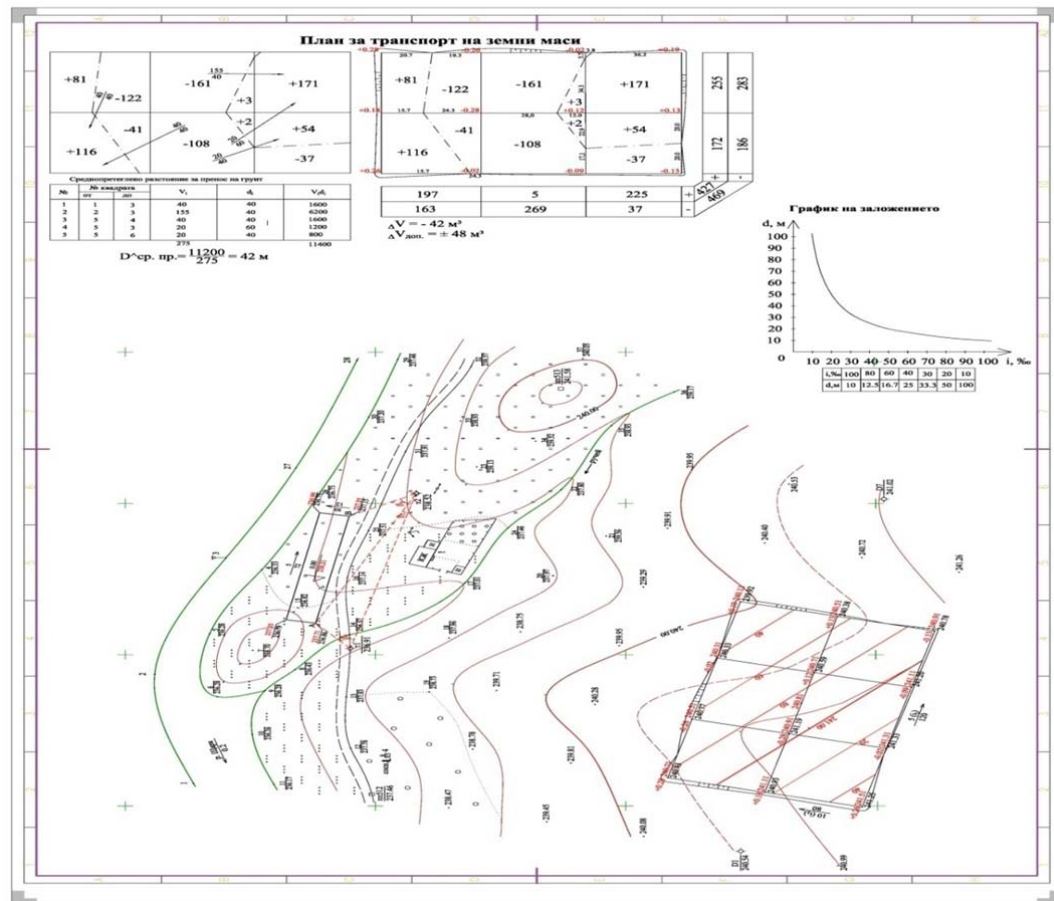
Situation and plan for transportation of earth masses - erosion zone 2 - gabion reinforcement
